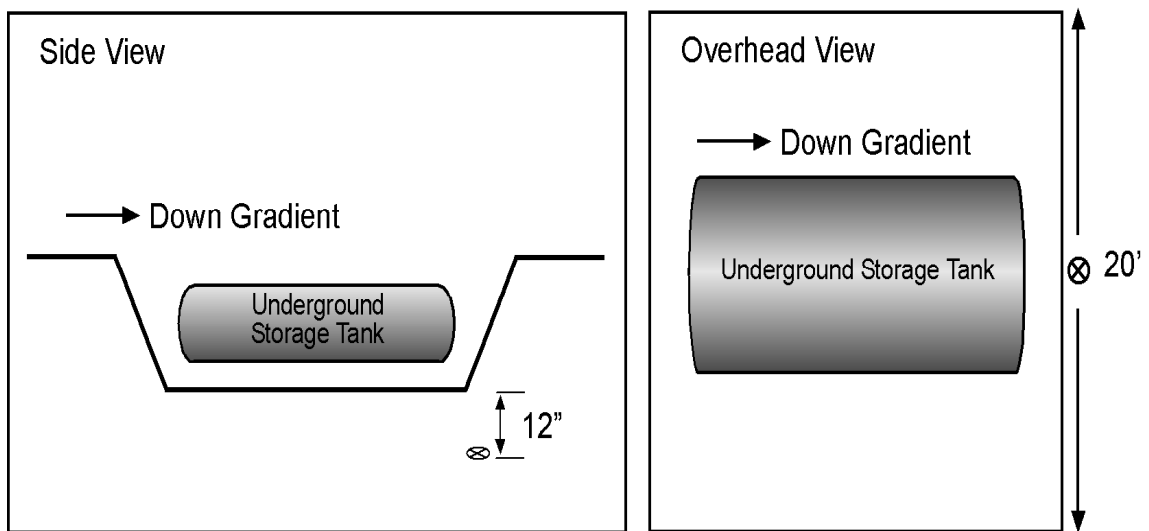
(c). Hydraulic Downgradient Wall Sampling, 20 Feet of Wall or Less
